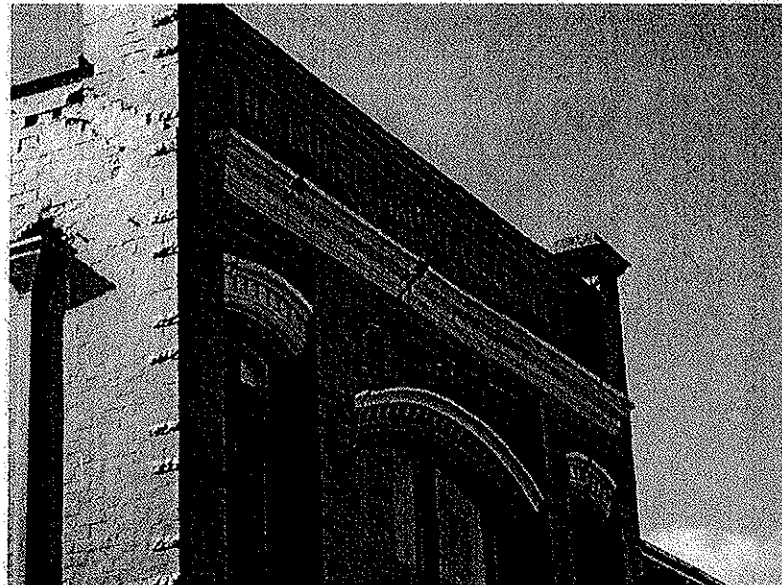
West facade 15 Feb - not out-of-plane offset of central lintel
